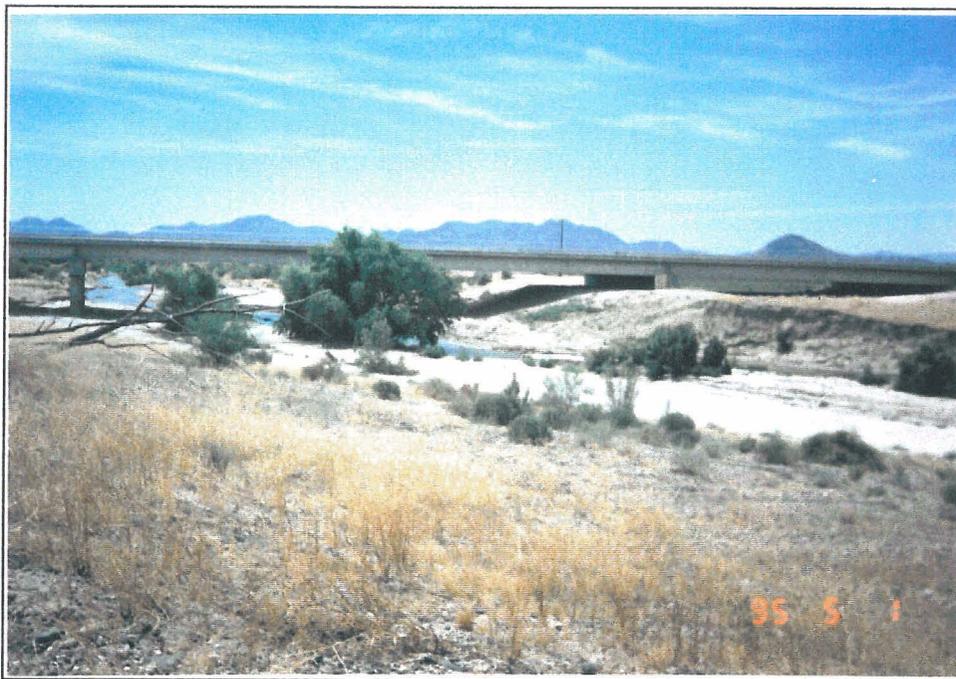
View looking toward upstream face of bridge from east levee embankment. Note trend of levee embankments and main channel is northwest upstream relative to structure and approximately south downstream of structure. Also note undercutting of west bank of upstream main channel by first order channel.
